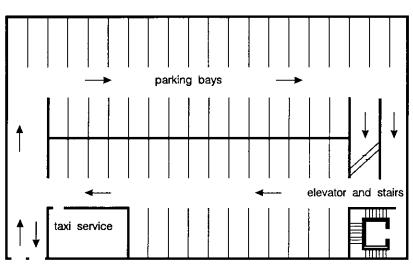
PLAN OF THE ENTRANCE FLOOR OF THE PARKING GARAGE IN THE DOVER TOWN CENTER
